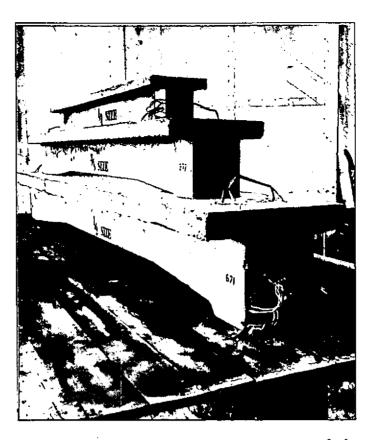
THE UNPROTECTED TYPE 'A' BEAMS
